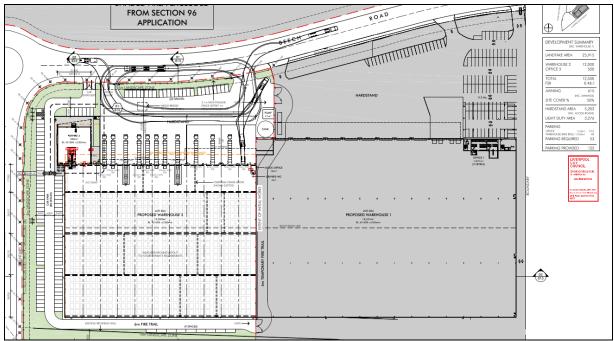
Extract of the approved Floor Plan under DA-594/2013/A
